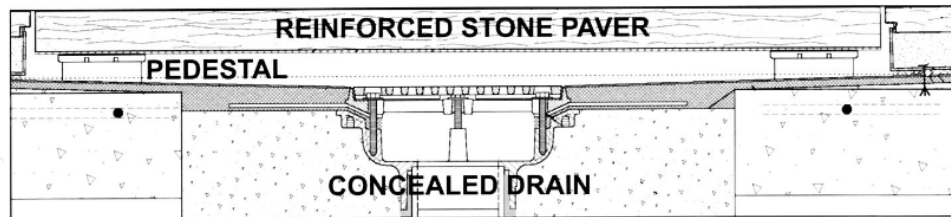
Detail of a section drawing showing reinforcement of the stone and drains at Lake Shore Drive Apartments, based on renderings by Krueck Sexton
